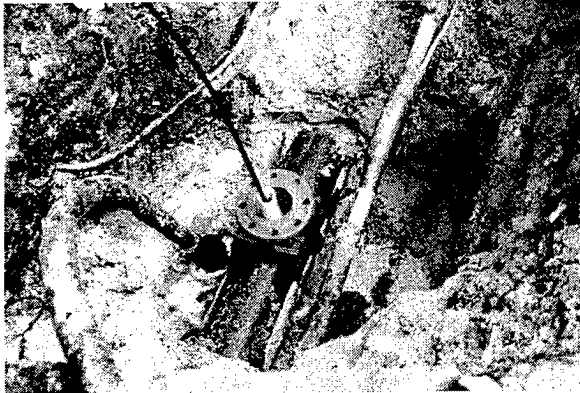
Superposed bottom part of the flange with arriving optical fibre cable
